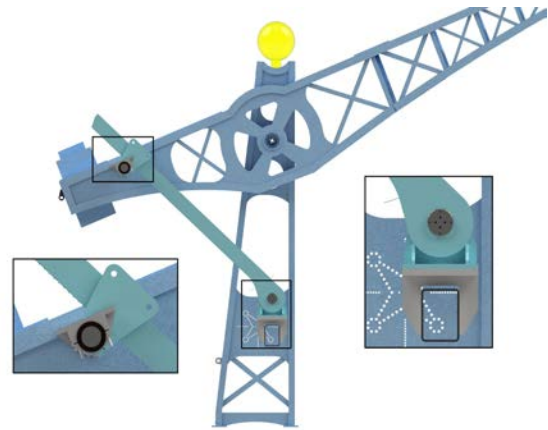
Side Elevation of Rack Beam with its Carriage Assembly and Pivot Support highlighted.
